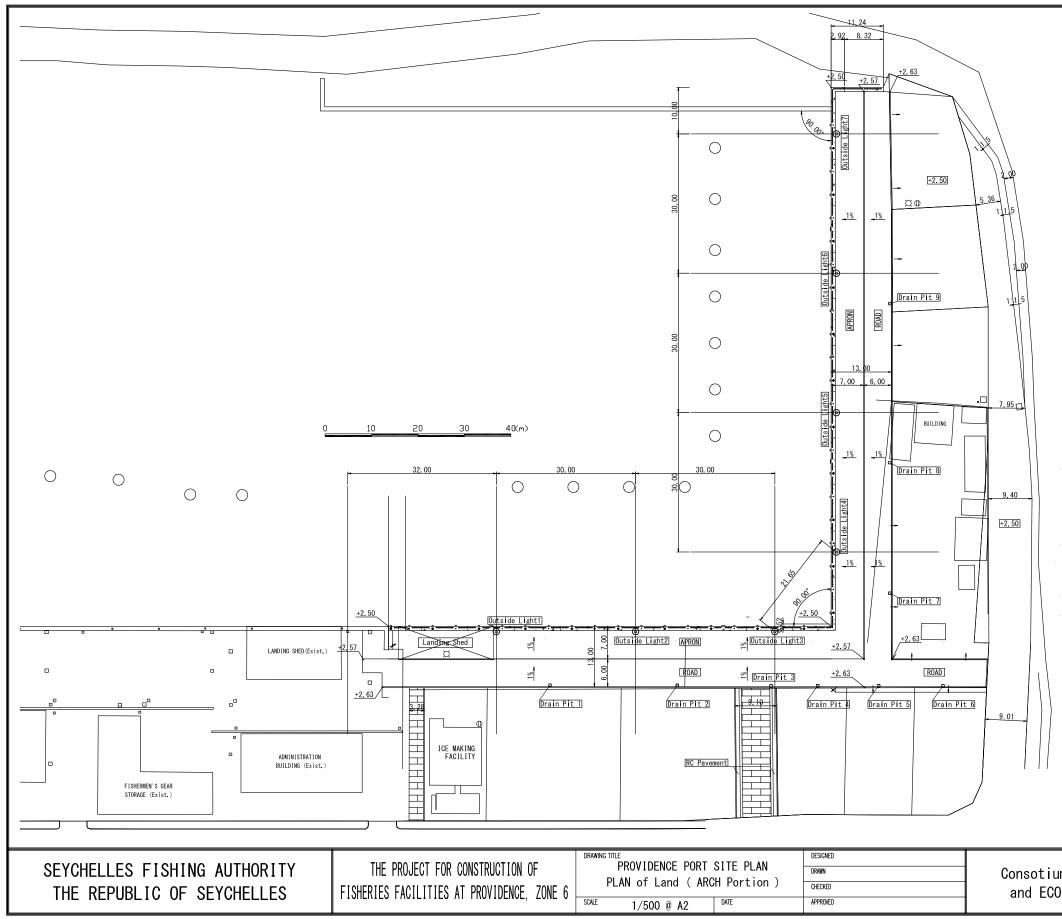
(17) Layout Plan of Ancillary Equipment
